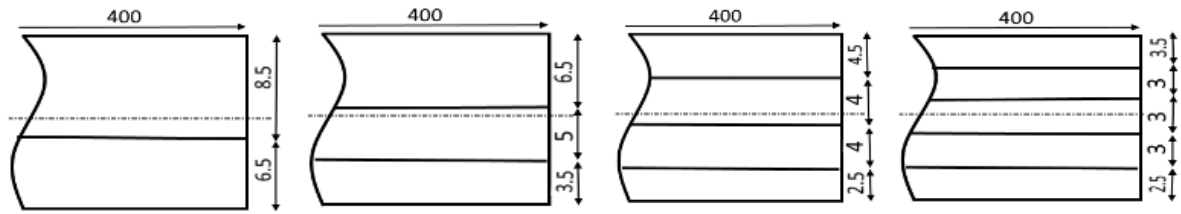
Schematic drawing of the arrangement of the basalt textile in the specimens (unit: mm).
